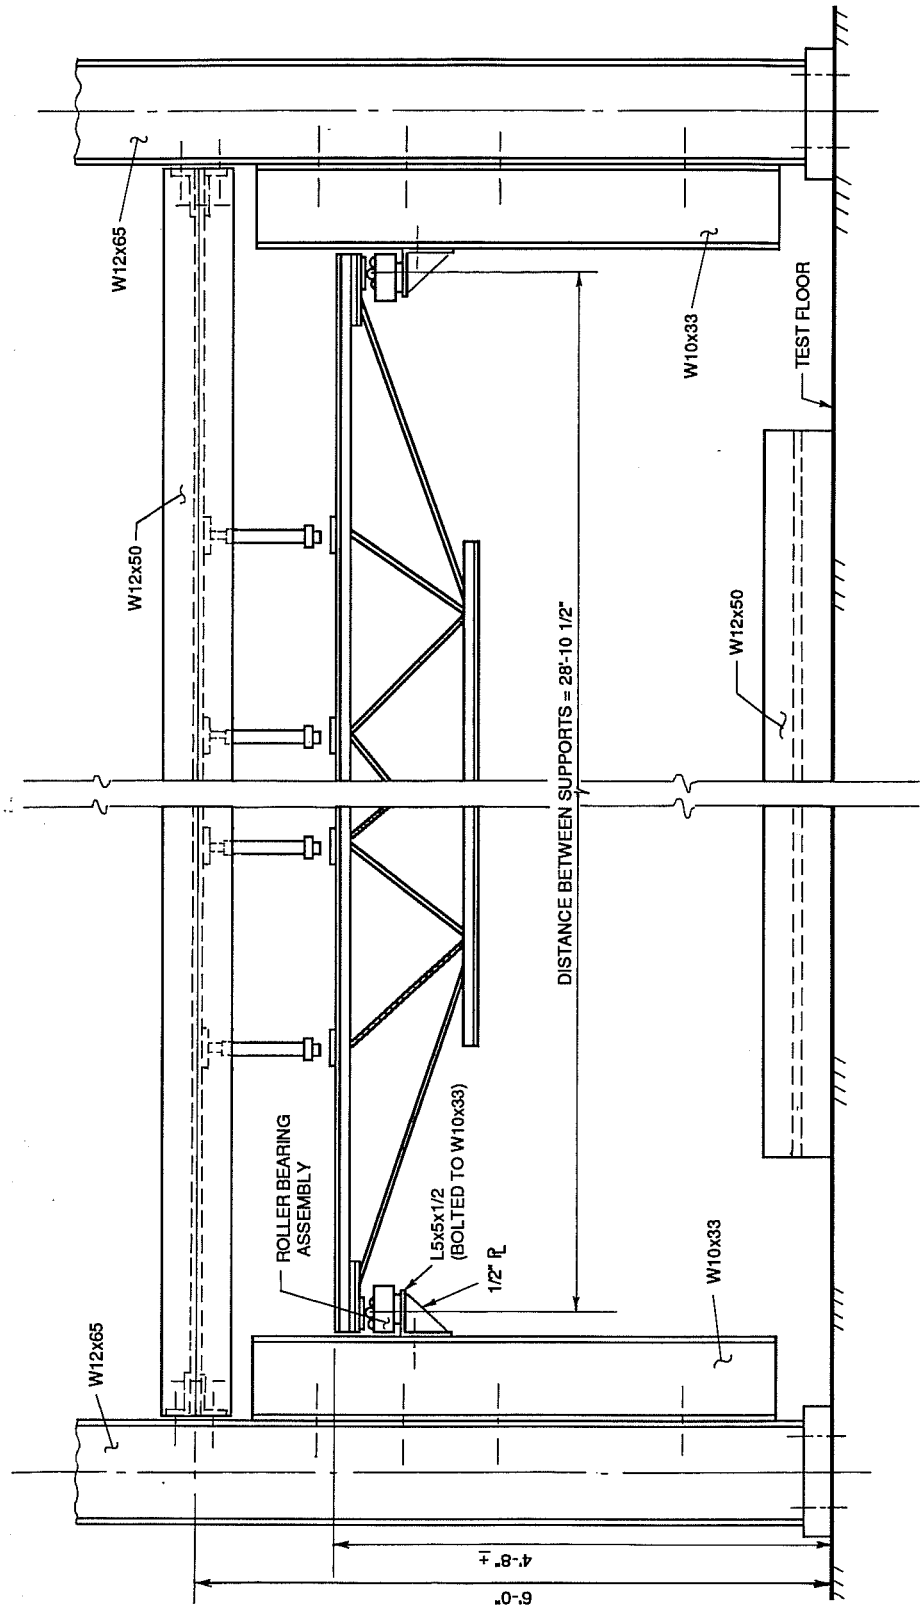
End Support Details for Joist Nos. 1 and 2
